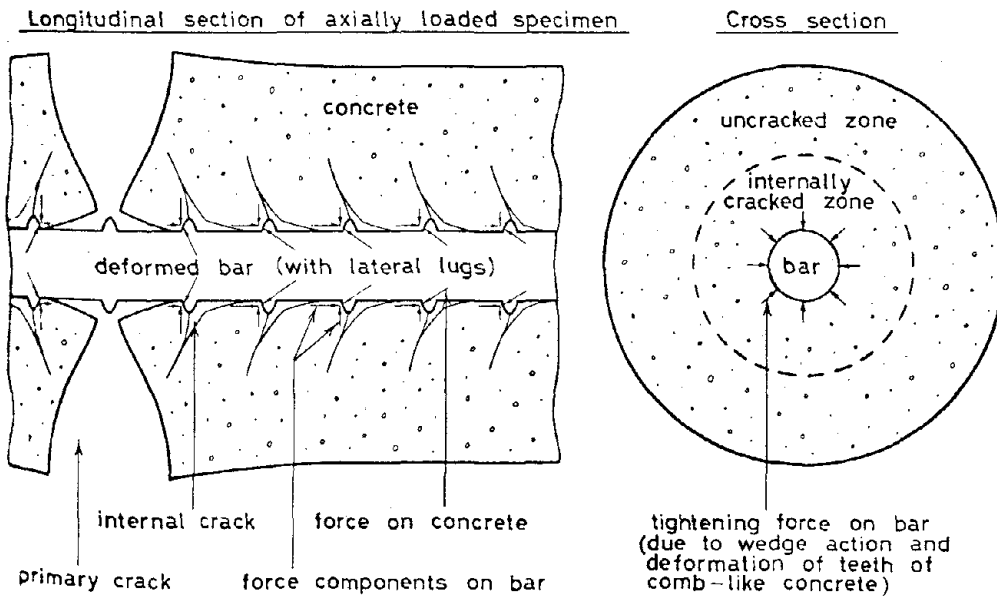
Deformation of Concrete Around Reinforcing Bars [10]
